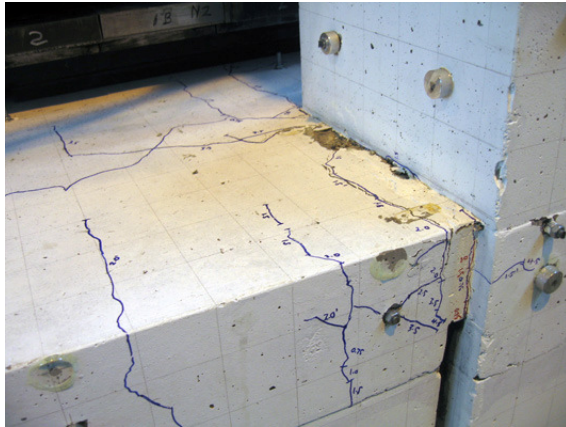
Crack development on back face of slotted specimen SB3 RHS beam
